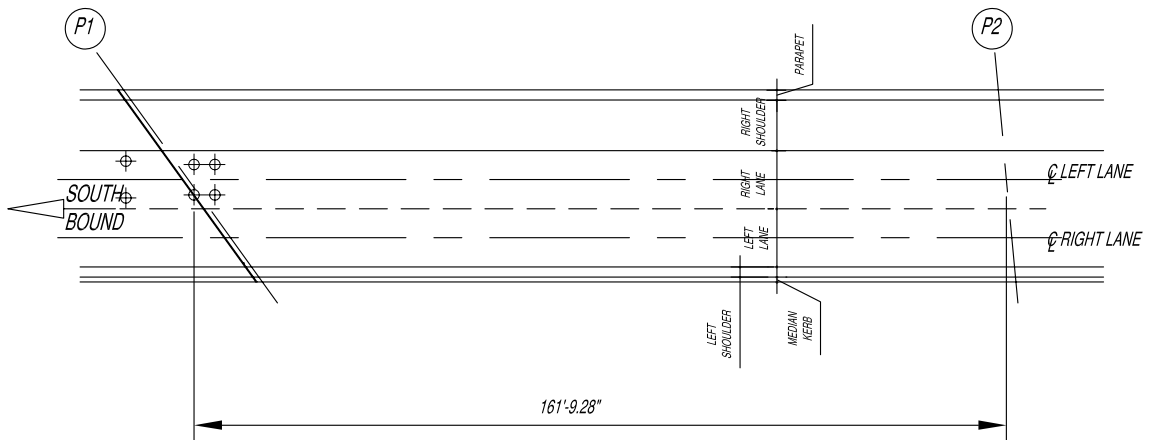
Wheel load disposition in Load Case 4 – controlled load test CRWL_1 right lane loaded over near bearing stiffener at Pier 1
